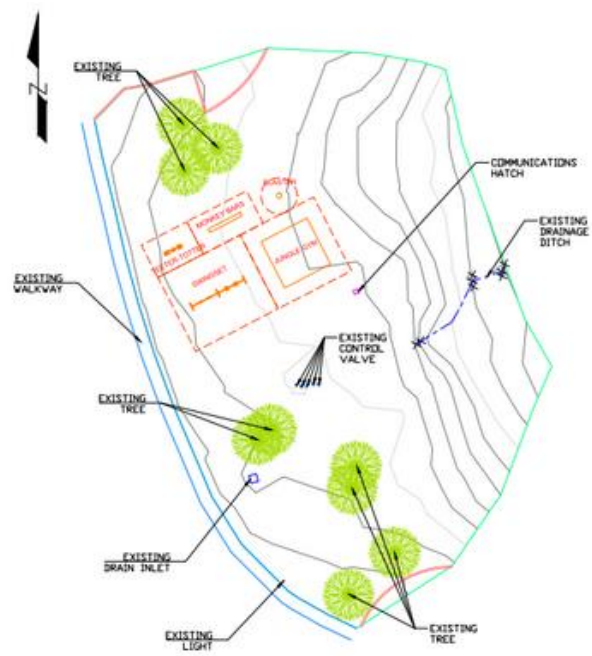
Surveyed site with equipment layout (including use zones) for Mines Park Playground
